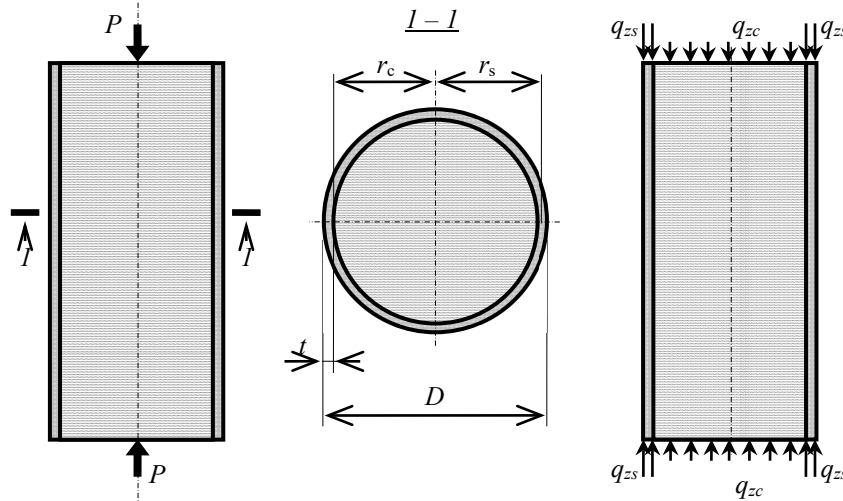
Design diagram of tube confined concrete element with high-strength concrete core
